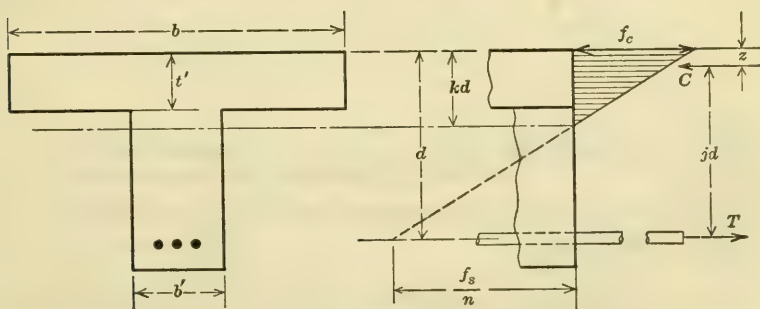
NOMENCLATURE FOR REINFORCED CONCRETE T-BEAM.
